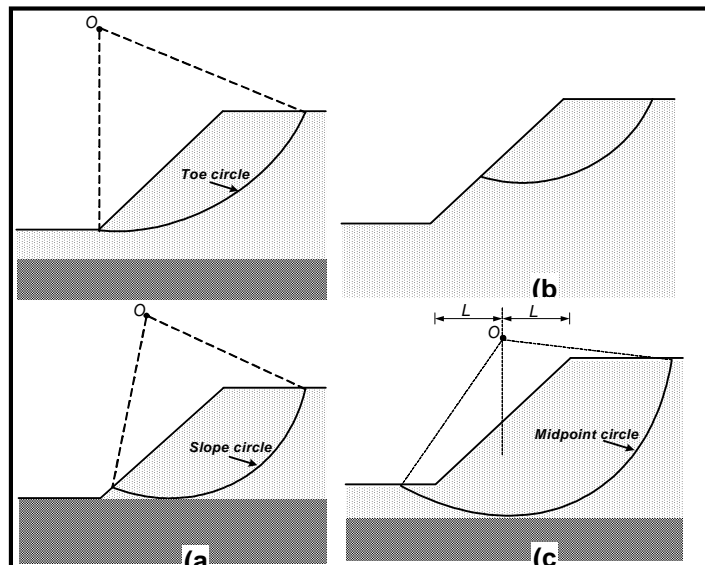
Mode of failure of finite slopes (a) slope failure, (b) shallow slope failure, and (c) base failure.
